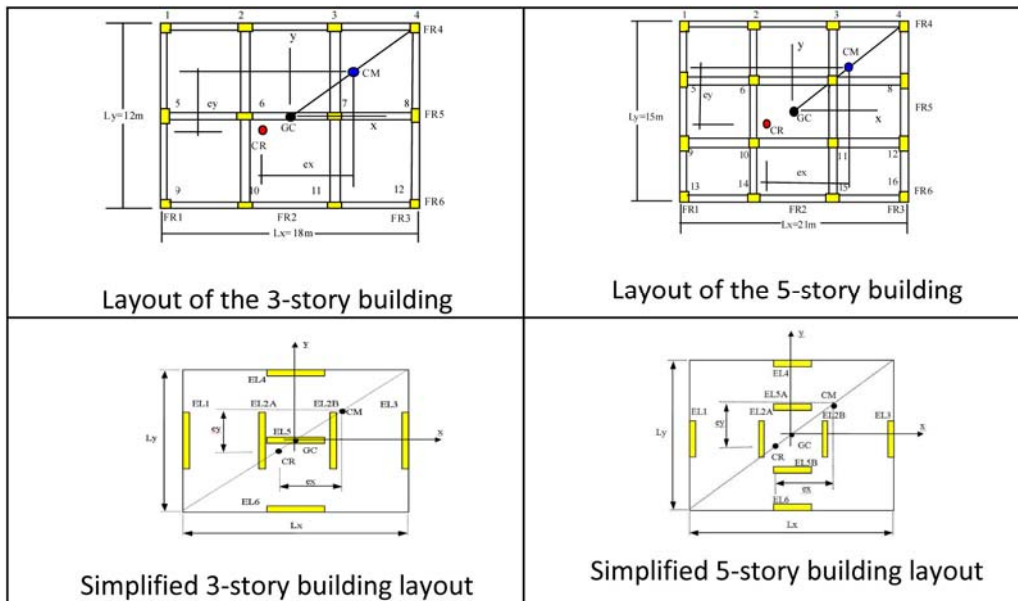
Layouts of 3 and 5-story buildings and 1ST-INSB their simplified models
